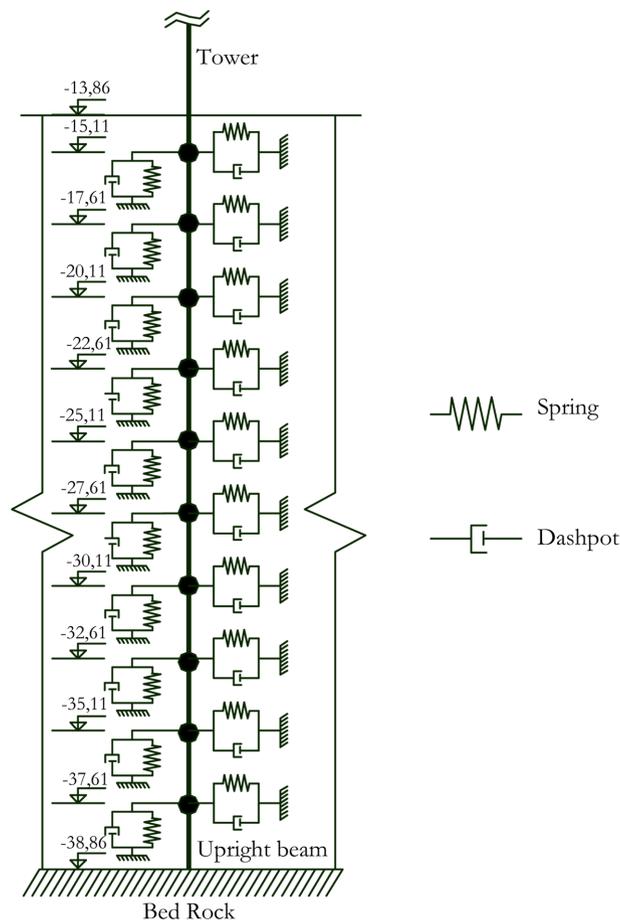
Schematic of beam on Winkler foundation model in the layered soil strata
